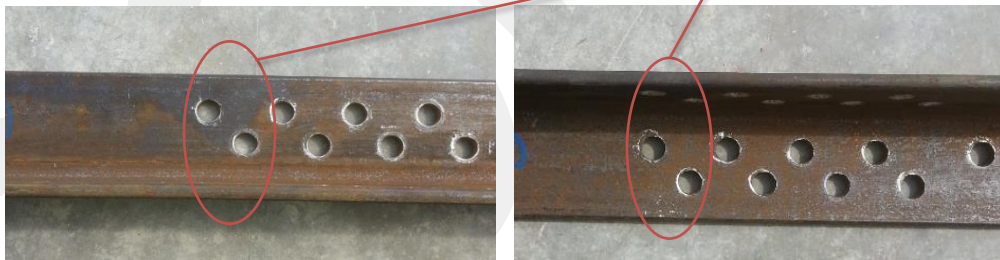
Bearing on lower main member 1 (Specimen-3)
